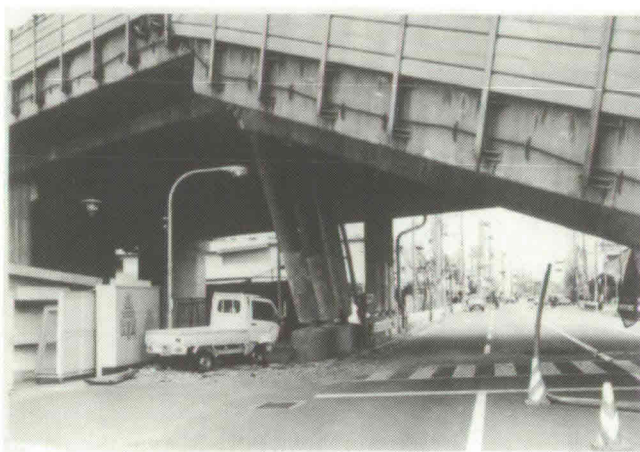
Overturned rocking column and collapsed RC hollow-slab girder (Meishin Expressway of Japan Highway Public Corp., at Kawaragi Nishi)
